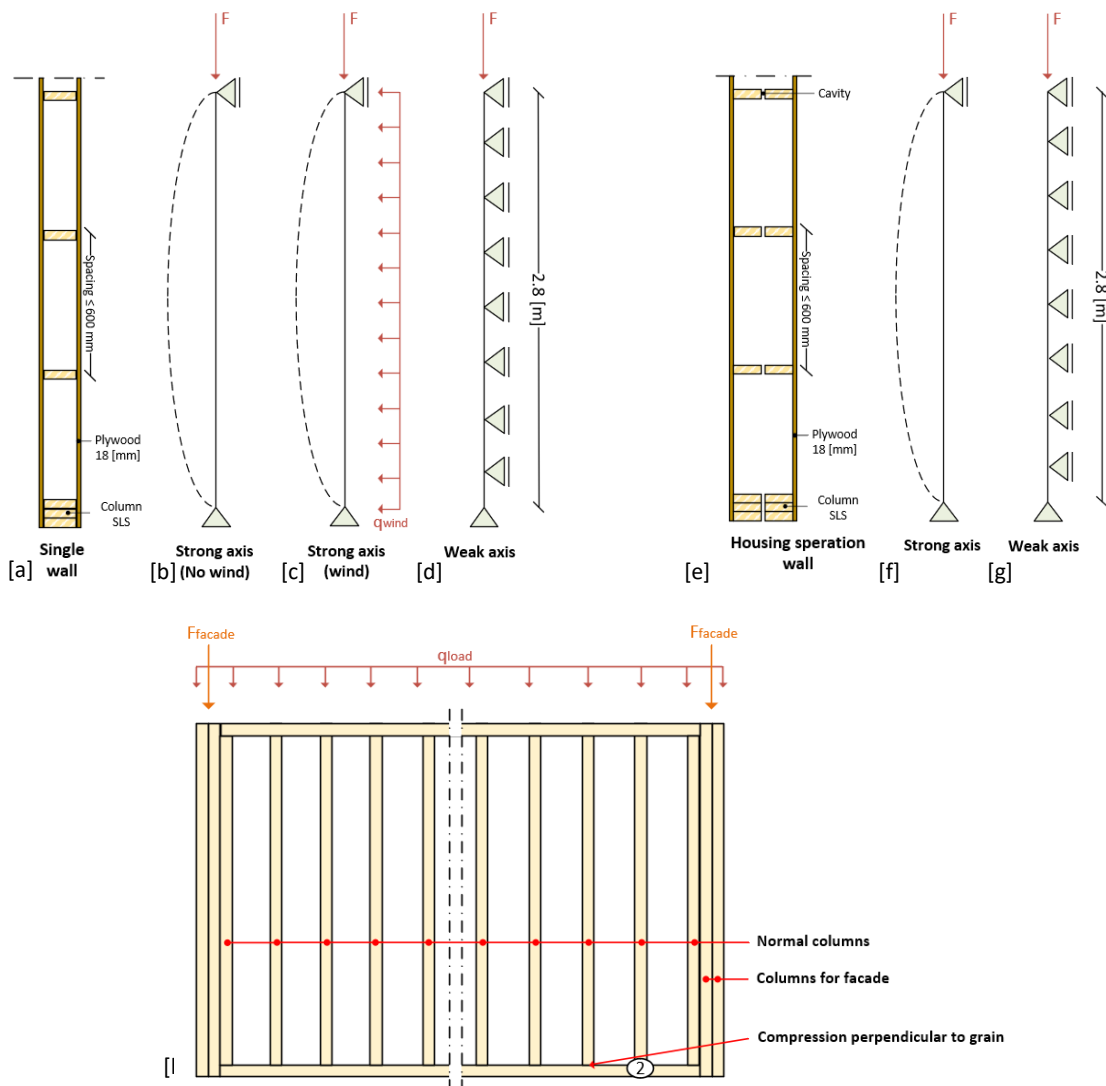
HSB walls, including structural schematization; [a] Top section single wall; [b] Str. scheme 1 strong axis (Single wall); [c] Str. scheme 2 strong axis (Normal wall); [d] Str. scheme weak axis (Normal wall); [e] Top section housing separation wall; [f] Str. scheme strong axis (Housing sep. wall); [g] Str. scheme weak axis (Housing sep. wall); [h] Side view of wall element (Self-produced).
